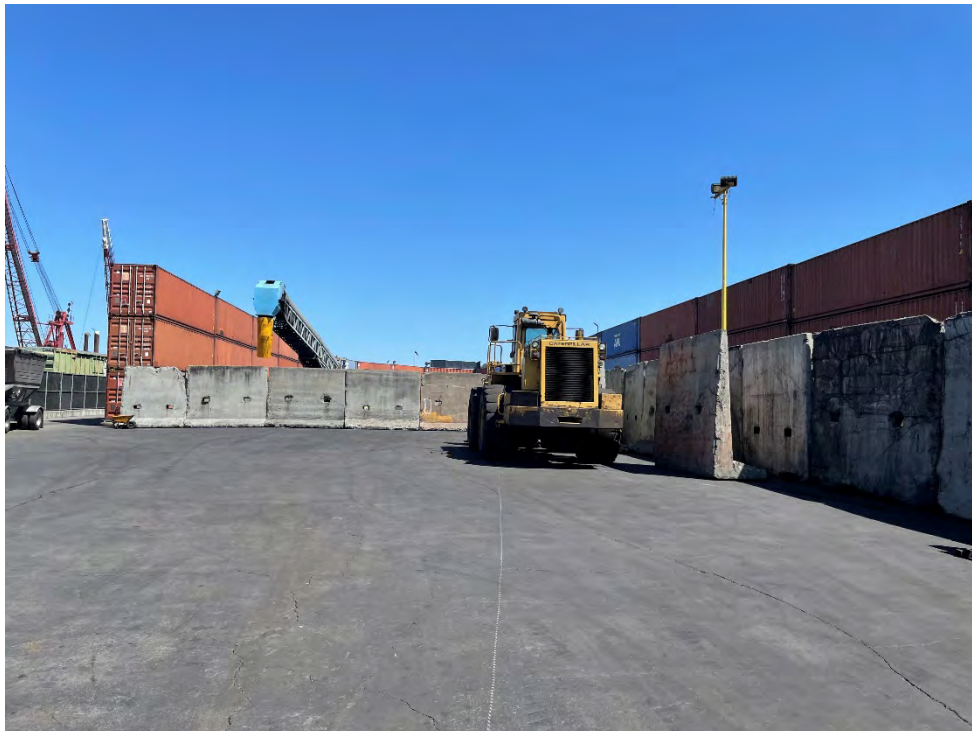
View of SW-3 drainage area looking north toward the secondary bulk product storage area. Minor surficial cracking visible.
